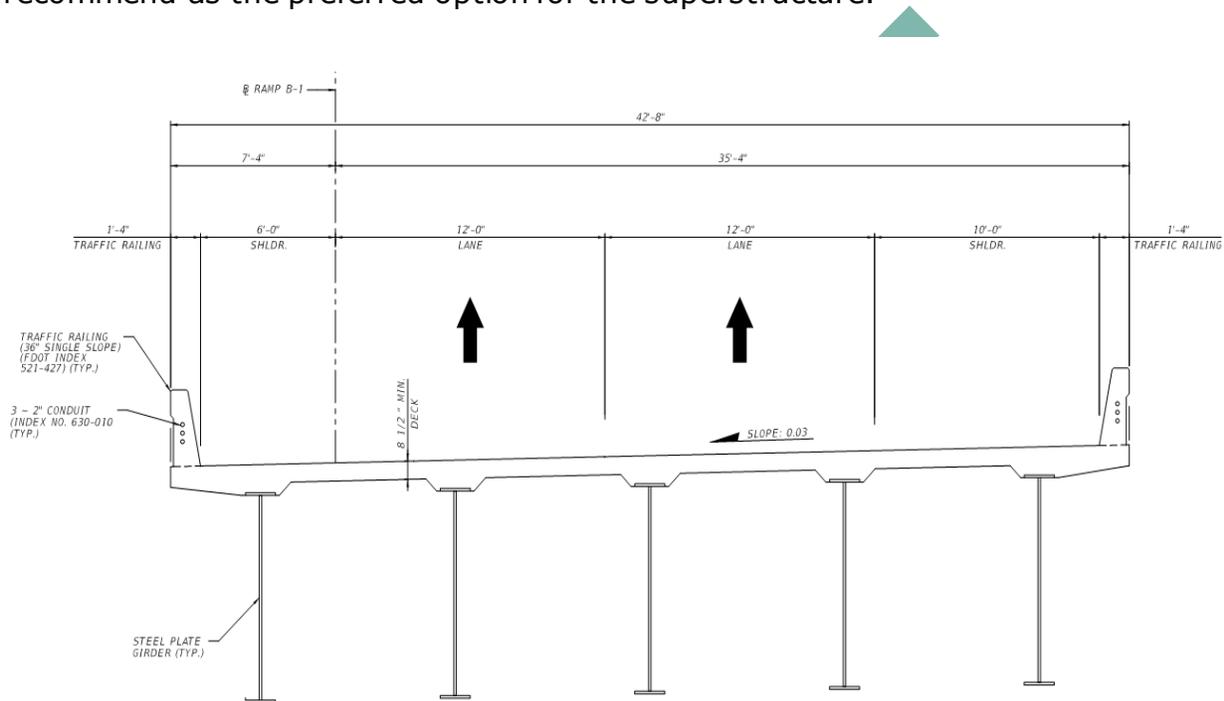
Bridge Typical Section (Bridge No. 14)
